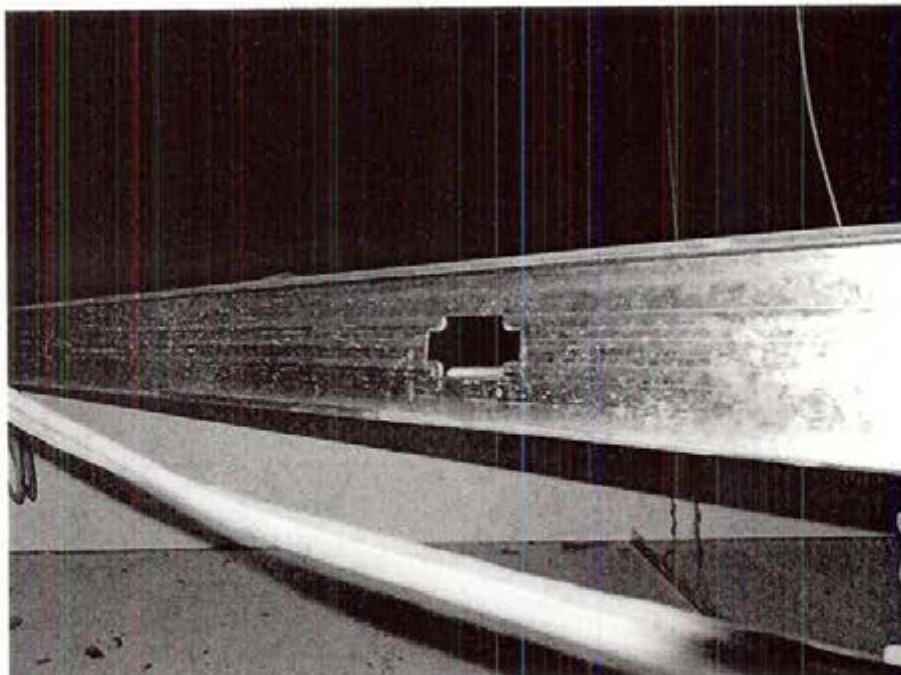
Lead wipe sample (042414-IFR-W-09) collected from a metal stud support; above the drop ceiling of the copy room.
